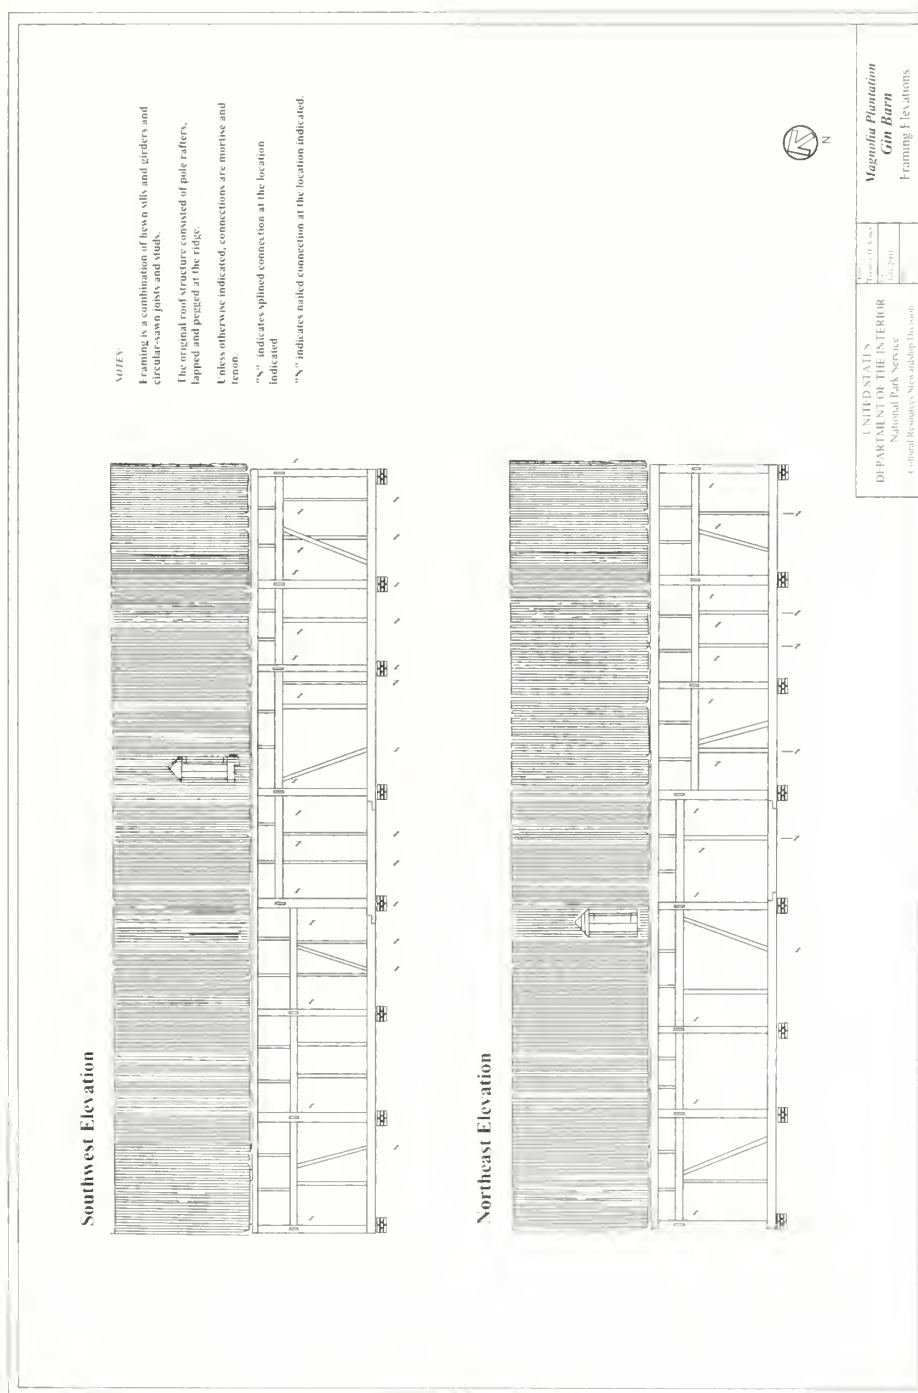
Elevations showing framing details. (NPS-SERO-CRS, 2001)
